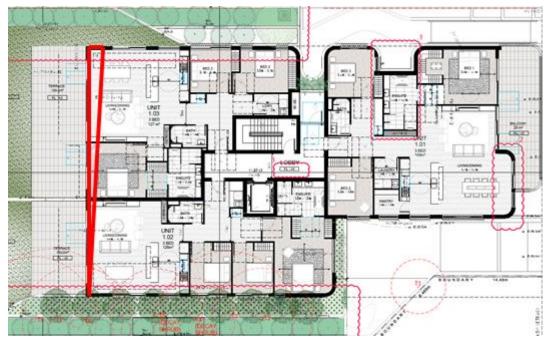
Plan extract DA101(C) depicting the extent of the proposed 2 storey element extending into the rear 25% area of the subject site bounded by the red lines
